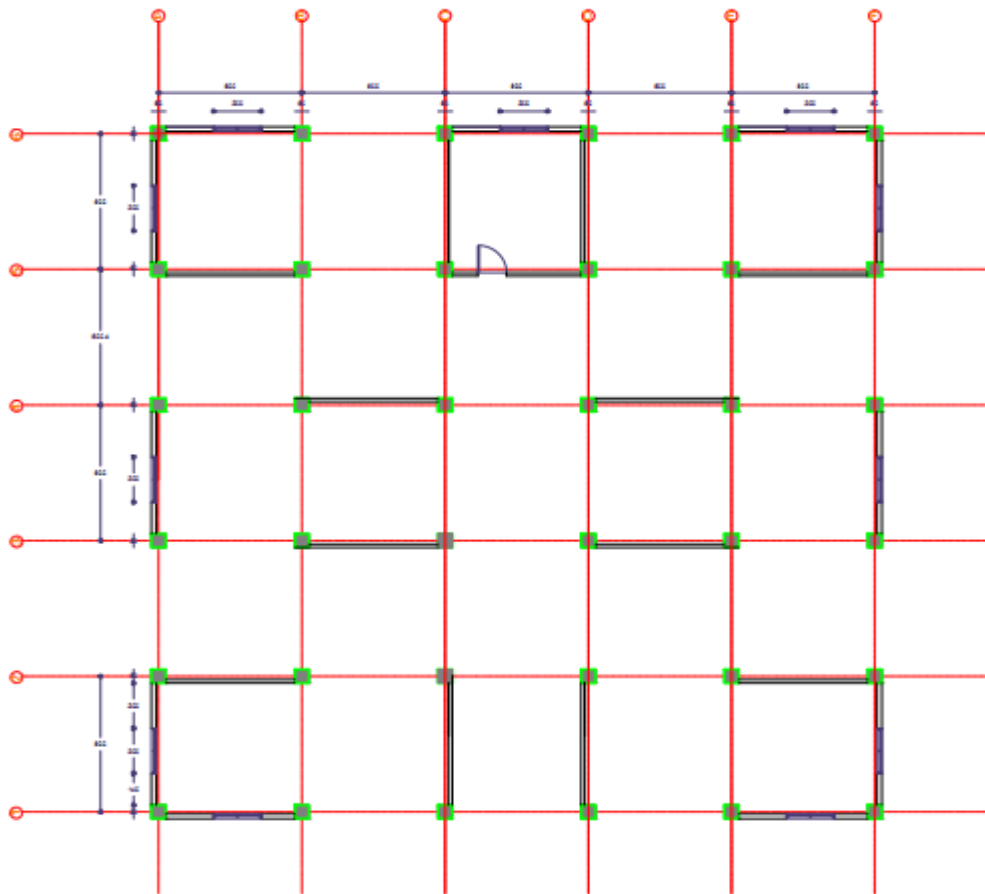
Typical floor plan of frame with half wall removed from base structure infilled frame
